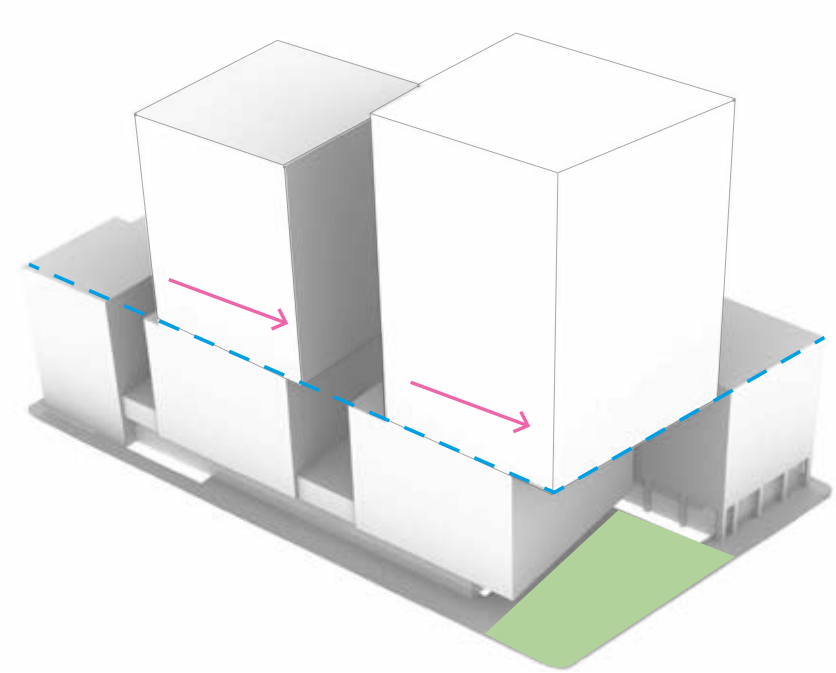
View of the massing model of one of the studies for the building for how the building could move towards Cromwell Road. This was the first time the cantilevered form was introduced
